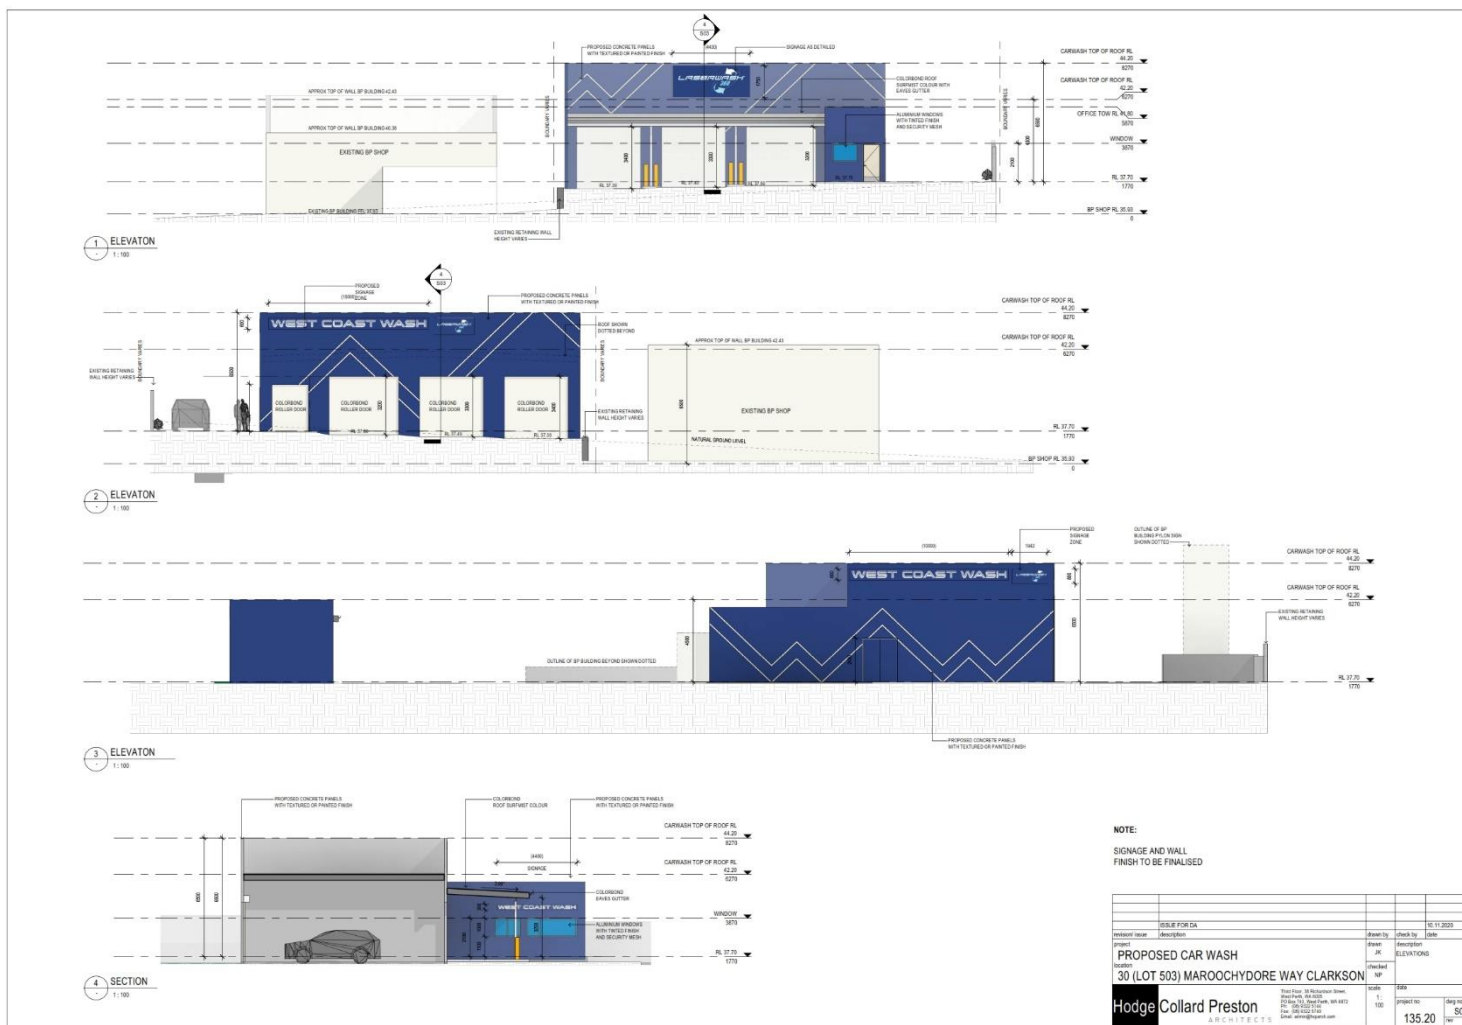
Site Elevations (source: Hodge Collard Preston)
